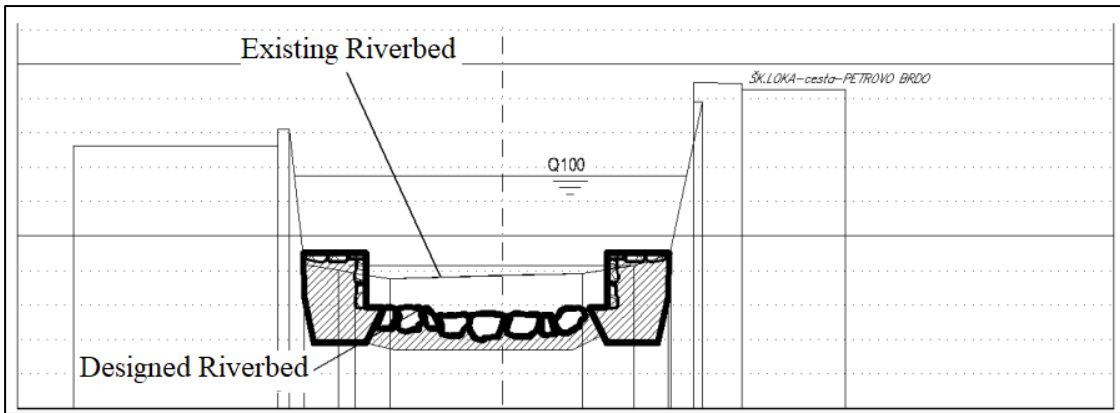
Typical cross-section between Domel and Dermot Dam [38]
